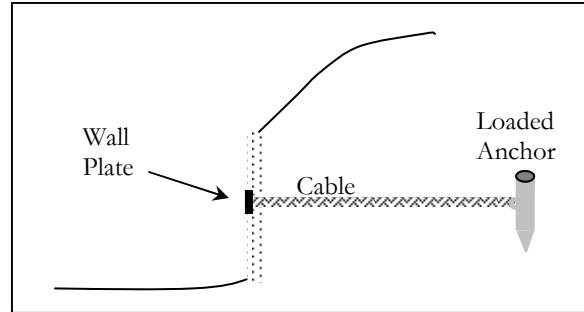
B. An earth anchor is driven into the soil and once the driving rod is removed the anchoring rod/cable is pulled to pivot the anchor into a load-lock position.
